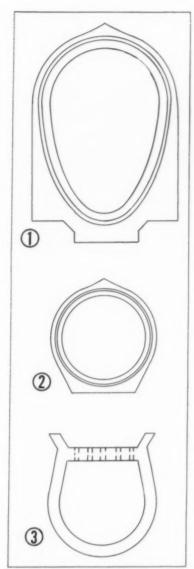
Types of pipe. 1—Egg-shaped "Amsterdamse proffelen." 2—Conventional round pipe. 3—Herz drain pipe with perforations in the top surface
